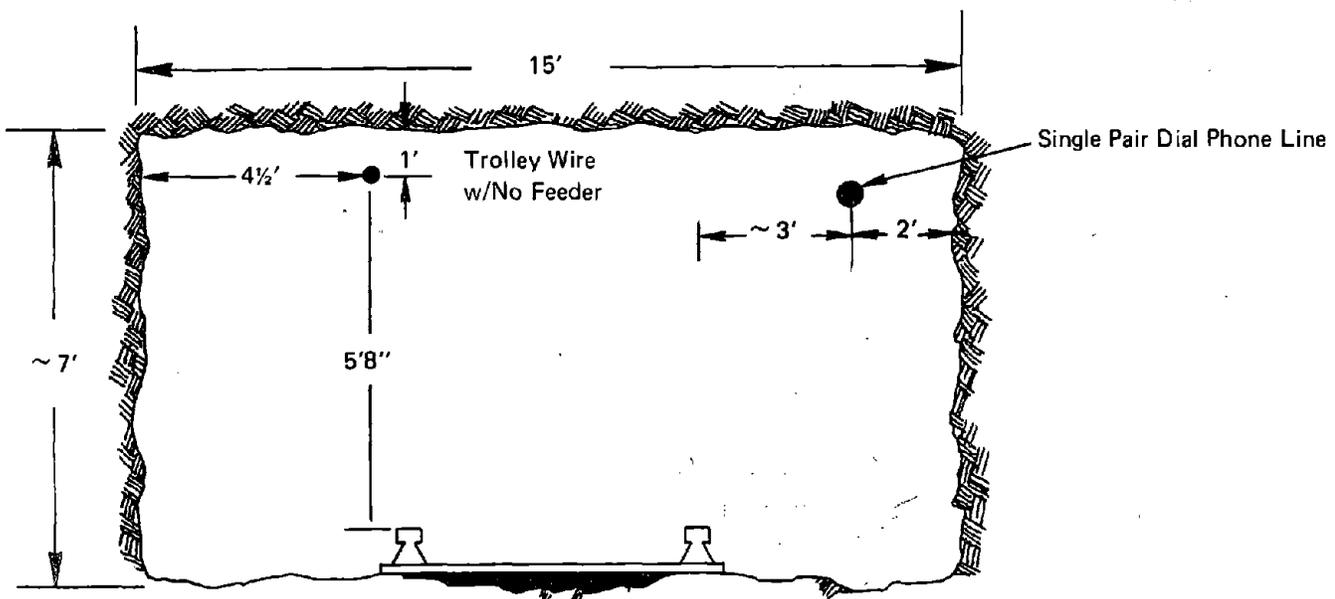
TYPICAL CROSS-SECTION - 062 SECTION HAULAGEWAY
